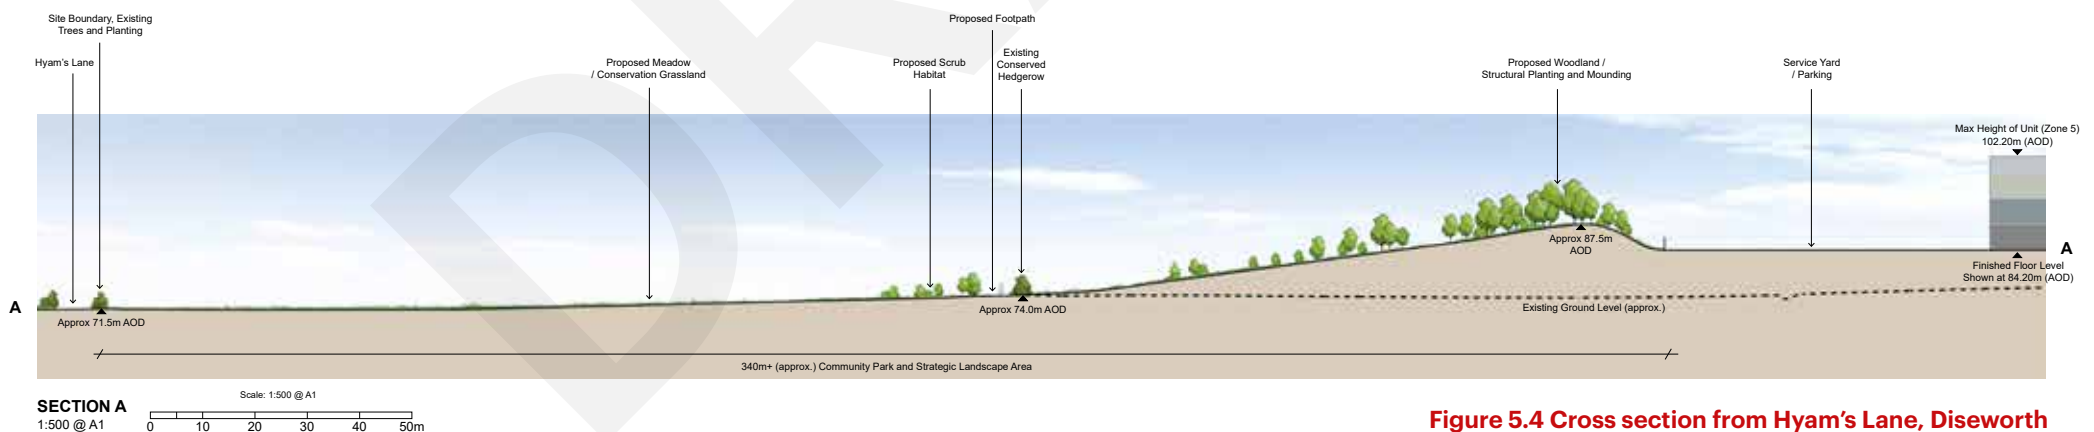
Cross section from Hyam's Lane, Diseworth
